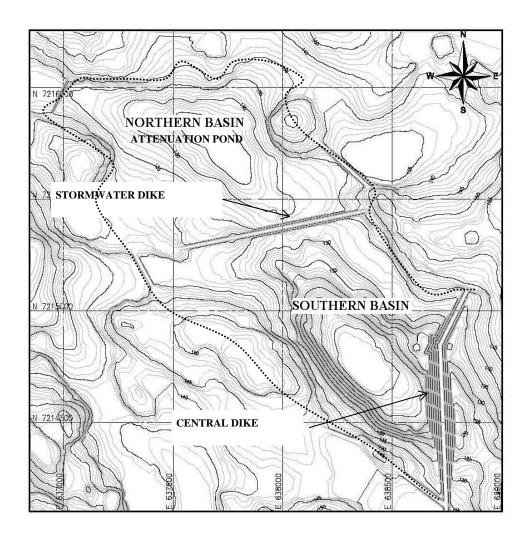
Meadowbank Gold Project - Tailings Storage Facility Layout
